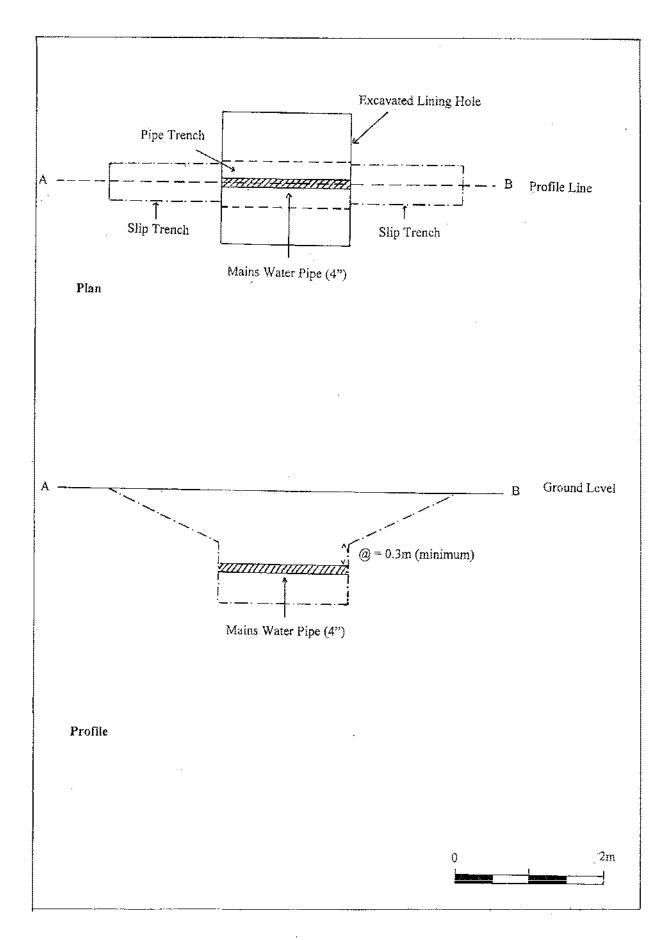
Wroxeter pipeline: plan and profile of typical lining hole
